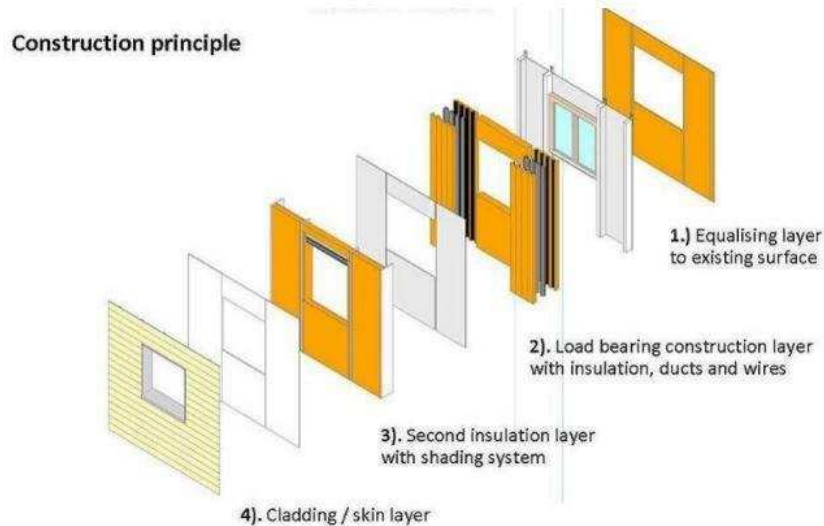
IEA prefabricated retrofit module construction principles (IEA, 2011)
